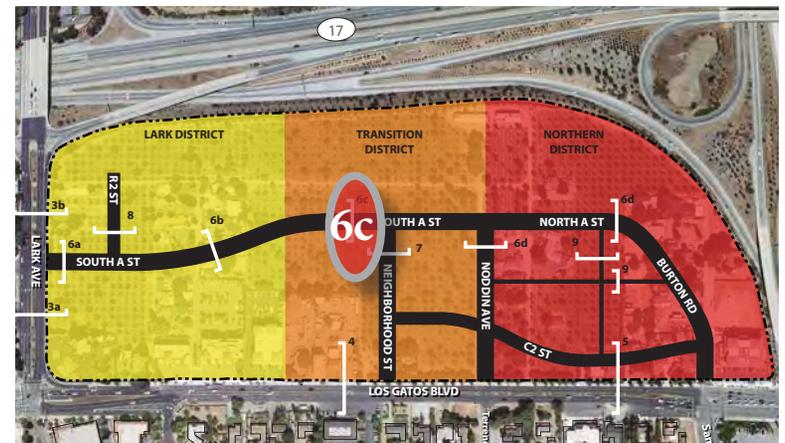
Section 6c: South 'A' Street looking north in the Transition District
